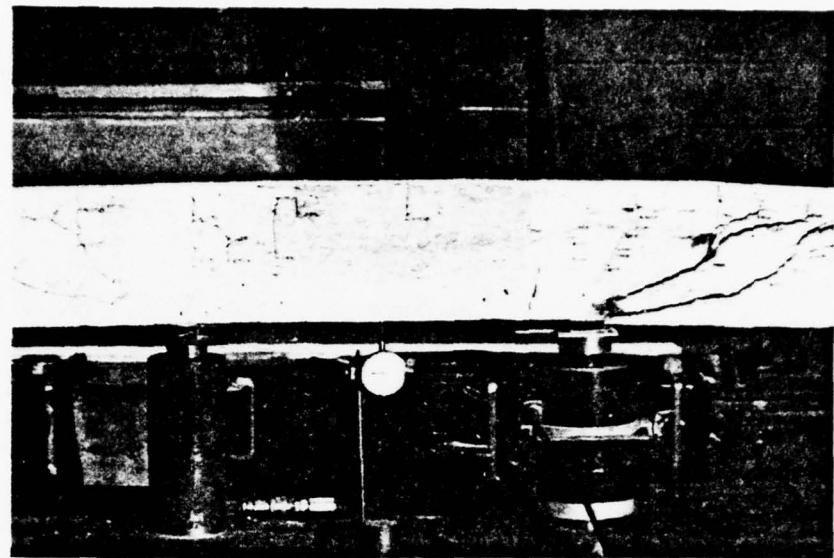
Bond Failure of T-4-E. Splice Length = 12 inches. Failure Moment = 24.9 kip-ft. Yielding of Tension Steel Was Obvious Prior to Bond Failure.
